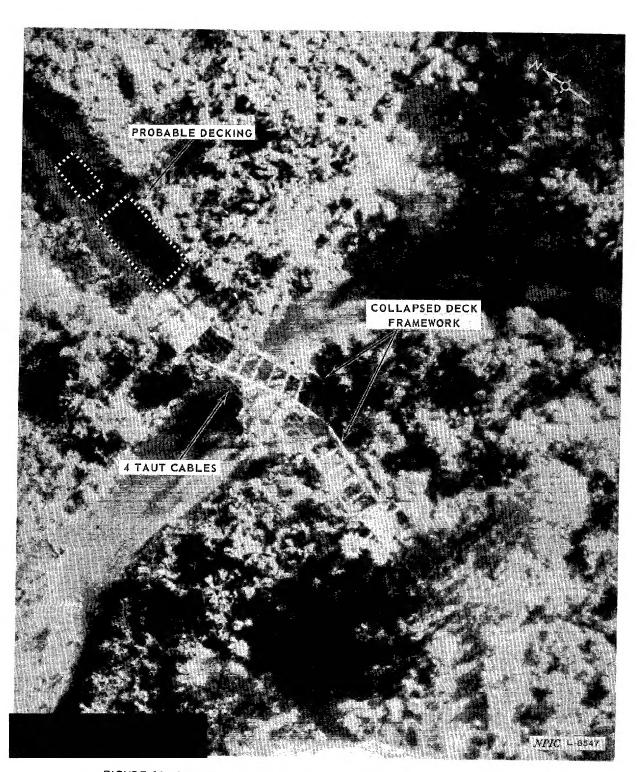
VEHICULAR CABLE BRIDGE, ROUTE 15, NORTH VIETNAM
